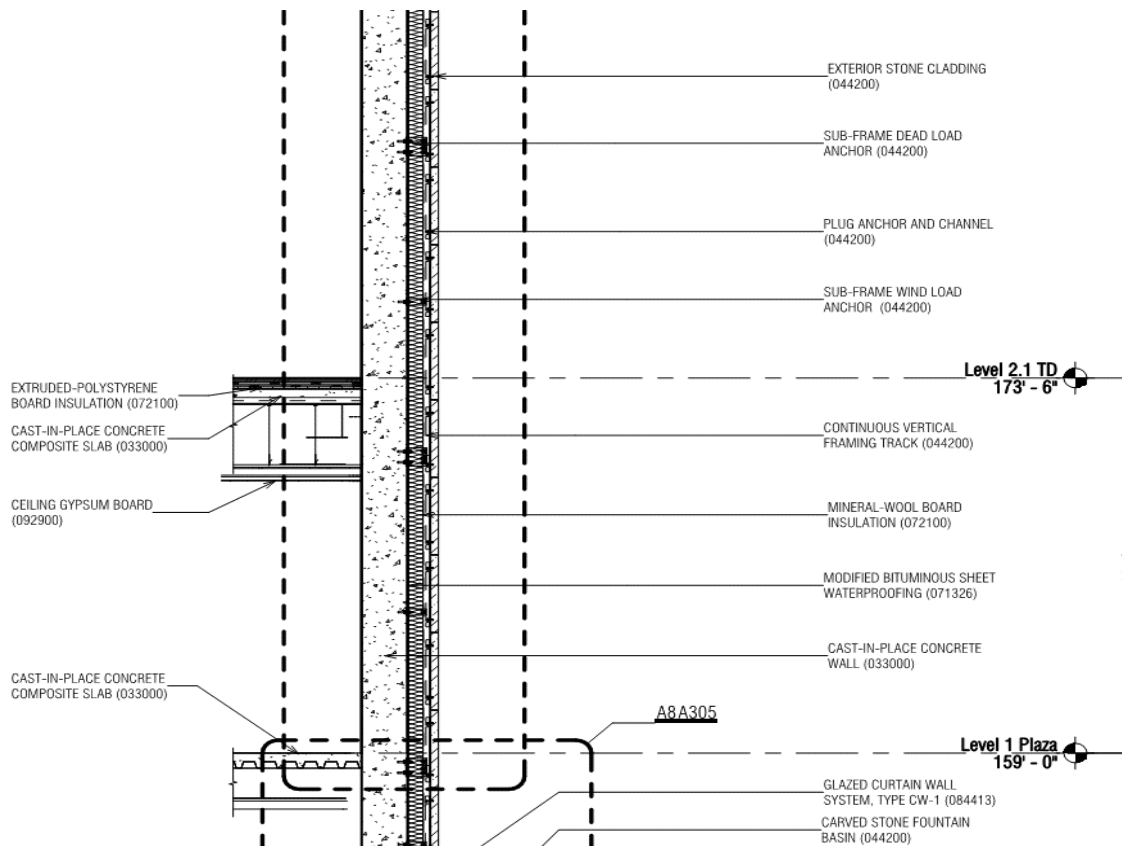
100% Contract Documents – Volume 6 – Turner Construction – Exterior Wall Sections
